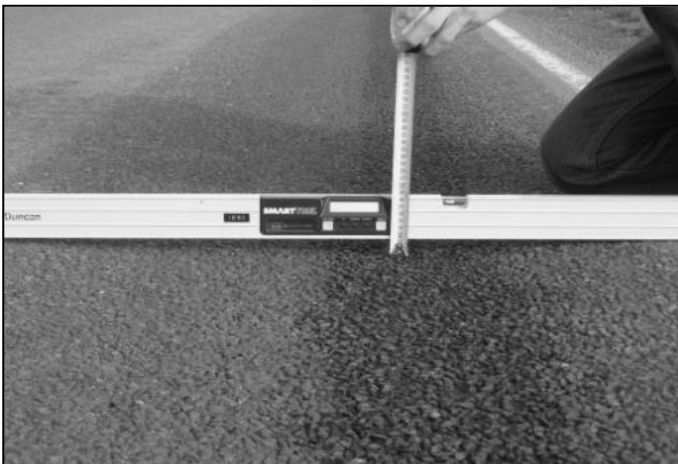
View of site D9, showing the overall poor condition of the pavement
